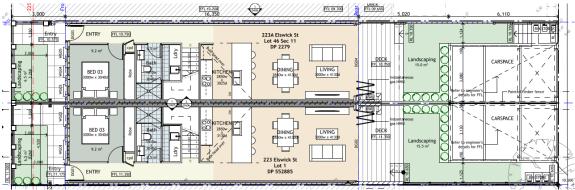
Proposed ground floor with rear carport at No. 223 Elswick Street North.
